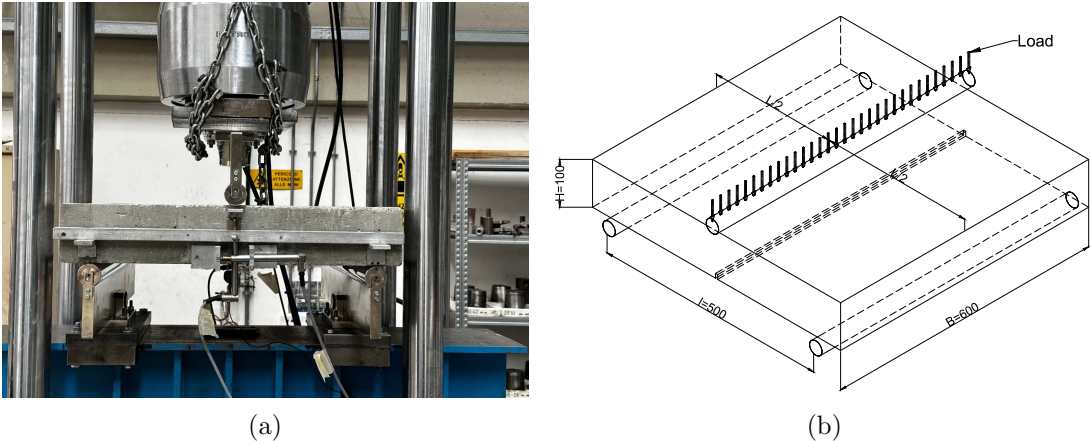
Set-up for EN 14488-3 test methodology [16]: (a) INSTRON 1274 closed-loop servo-hydraulic machine (b) Arrangement of load application on the test specimen.
